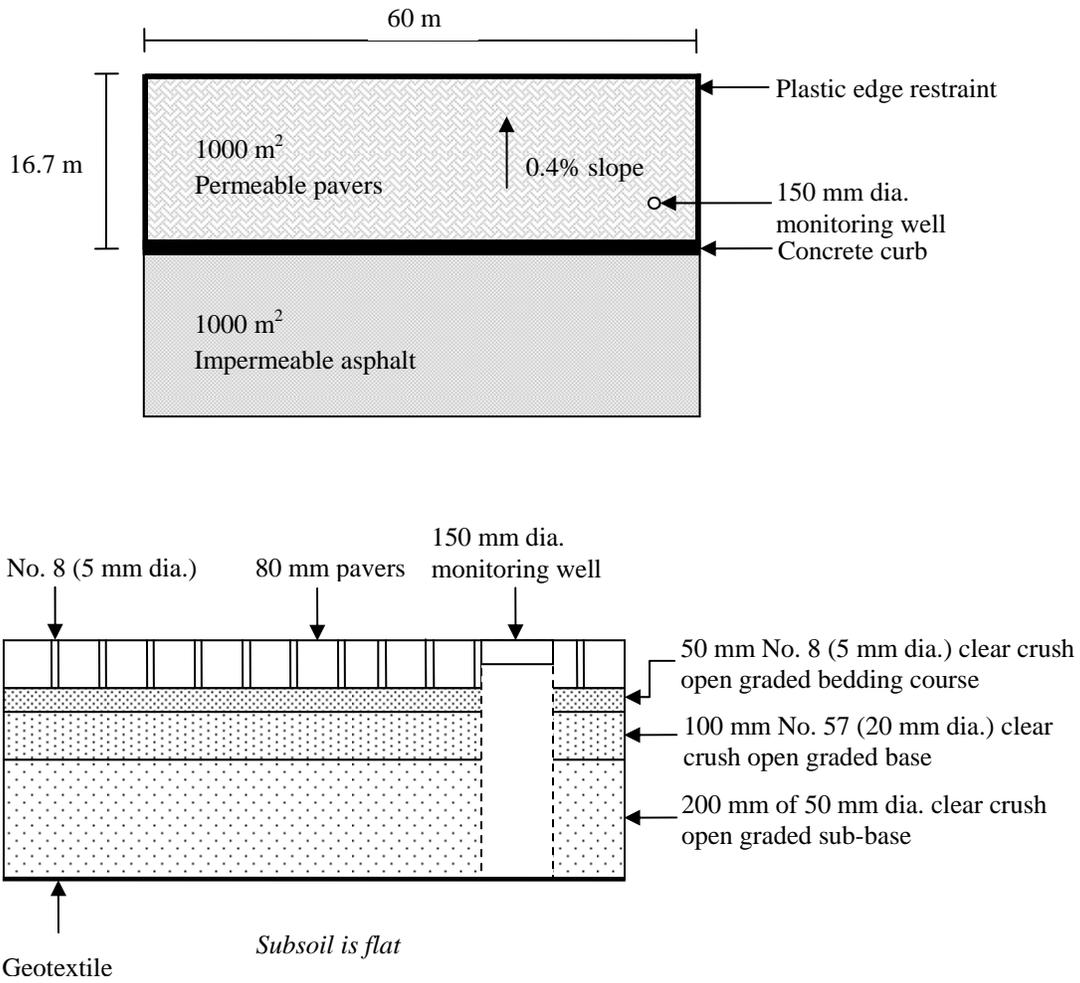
Permeable pavement full infiltration design. Plan view (top); cross section (bottom)
